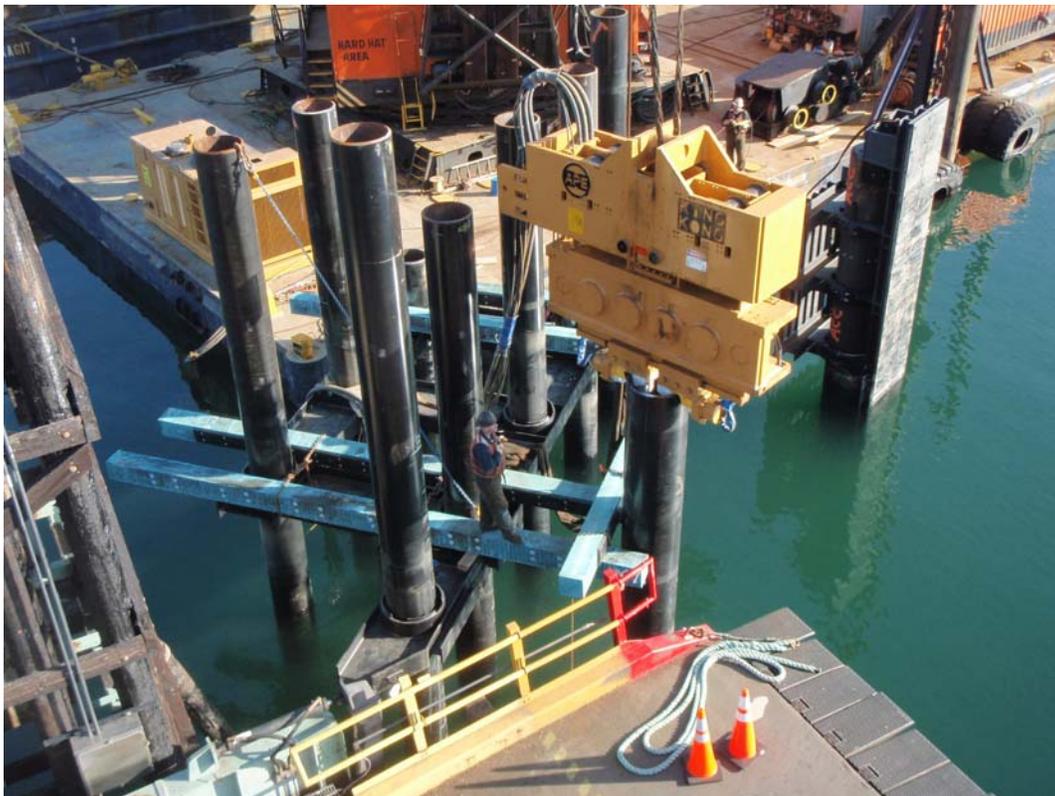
Vibratory Hammer Driving a Steel Pile
